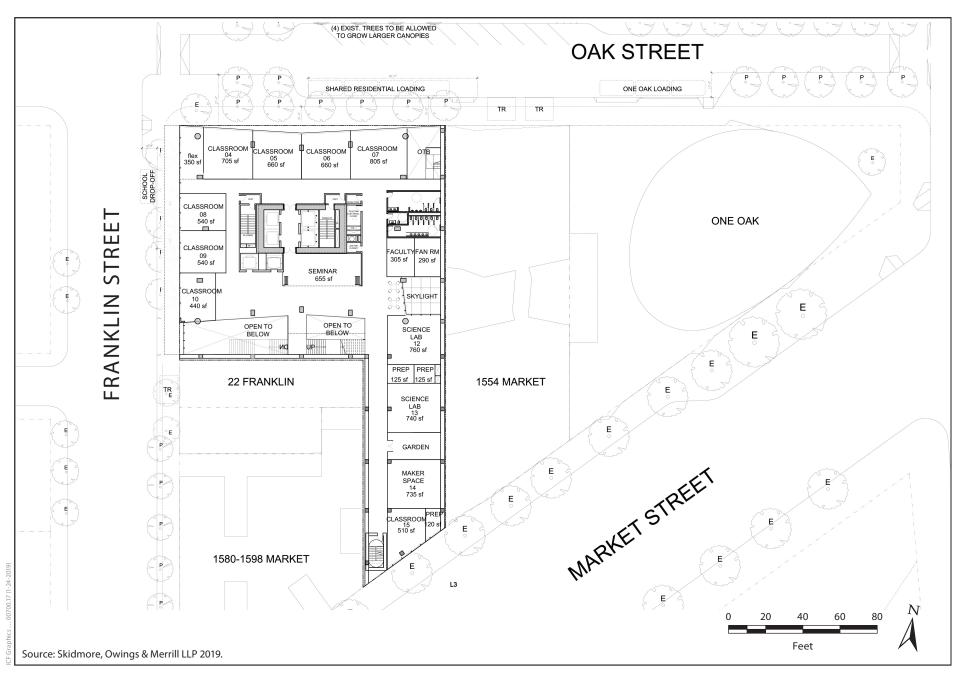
98 Franklin Street Project – Proposed 3rd Level Floor Plan
